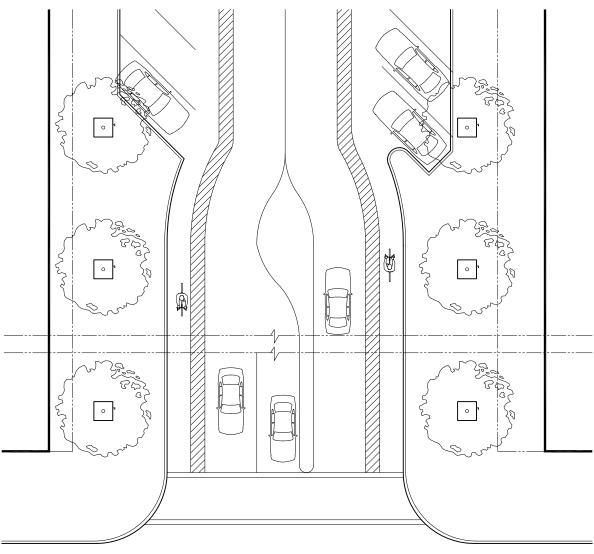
Street Type 1: Typical Intersection (Plan View)
